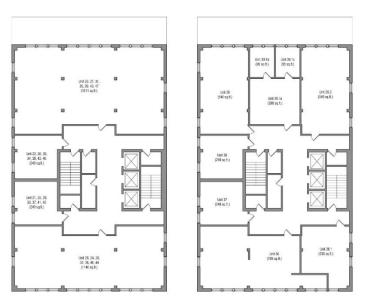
, 311 (left to right): Building 10, tenth floor (1921); same floor (1979). 1" = 32'. North is up.
